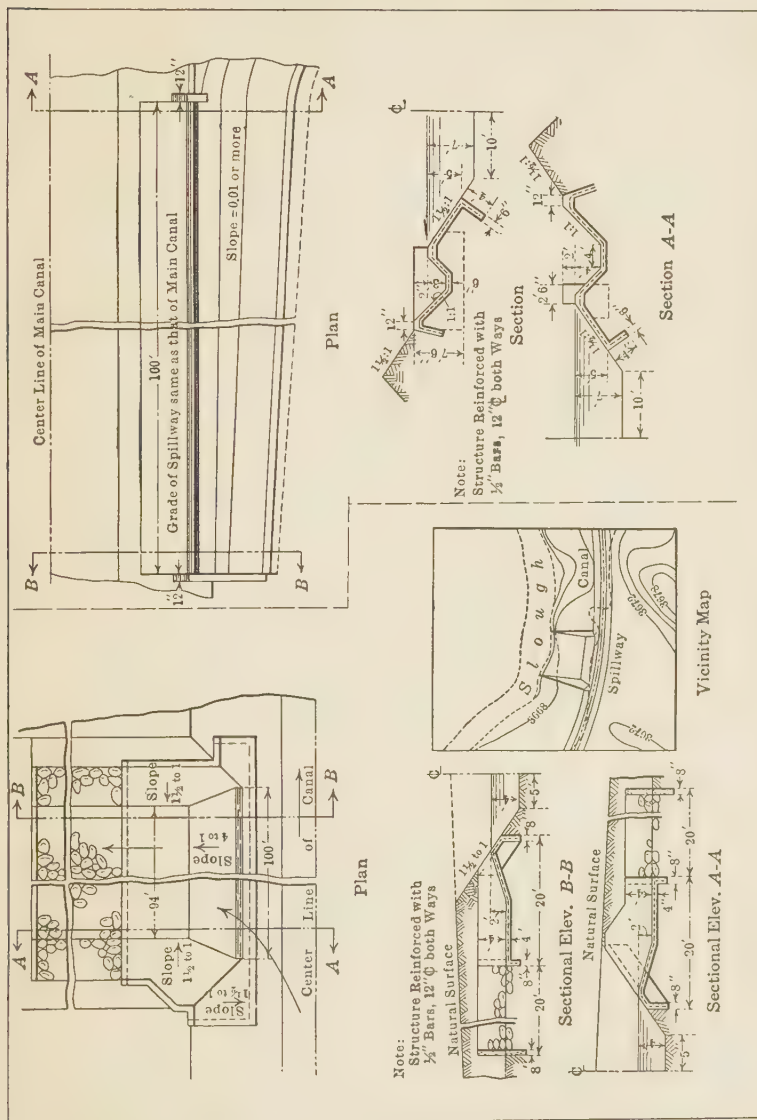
Overflow spillway. Sun River Project, Mont.
